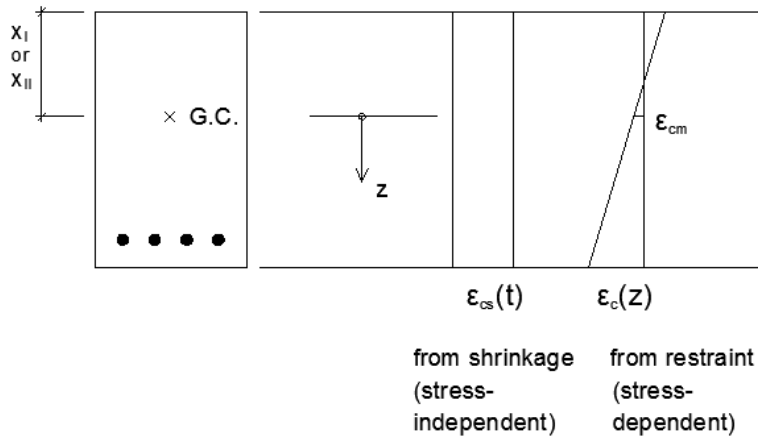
Reinforced concrete section with eccentric reinforcement and uniform shrinkage. The restraint from the steel results in both a stress-dependent average strain  $\epsilon_{cm}$  and curvature (Engström, *Restraint cracking of reinforced concrete structures*, 2014).
